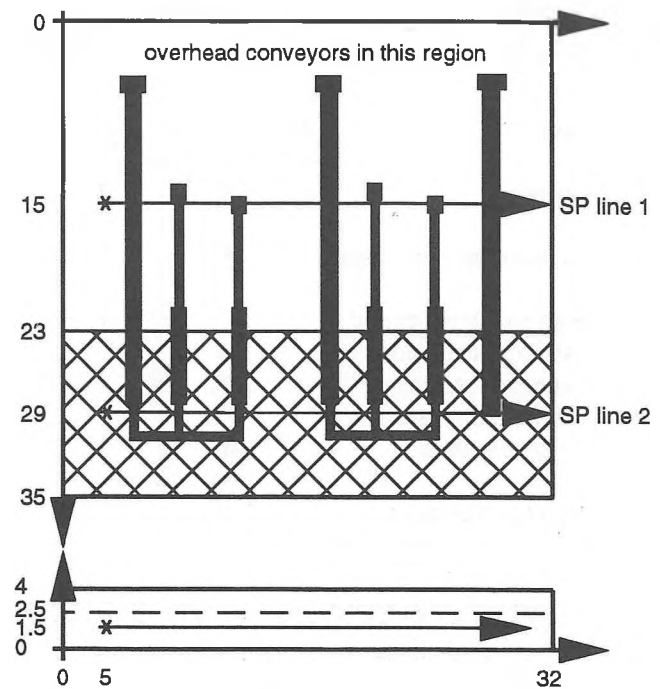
Plan and elevation of the food-packing hall as modelled, showing coordinated (in metres), sound propagation (SP) lines, extent of the partial ceiling treatment (cross-hatched) and the equipment layout (in black).
